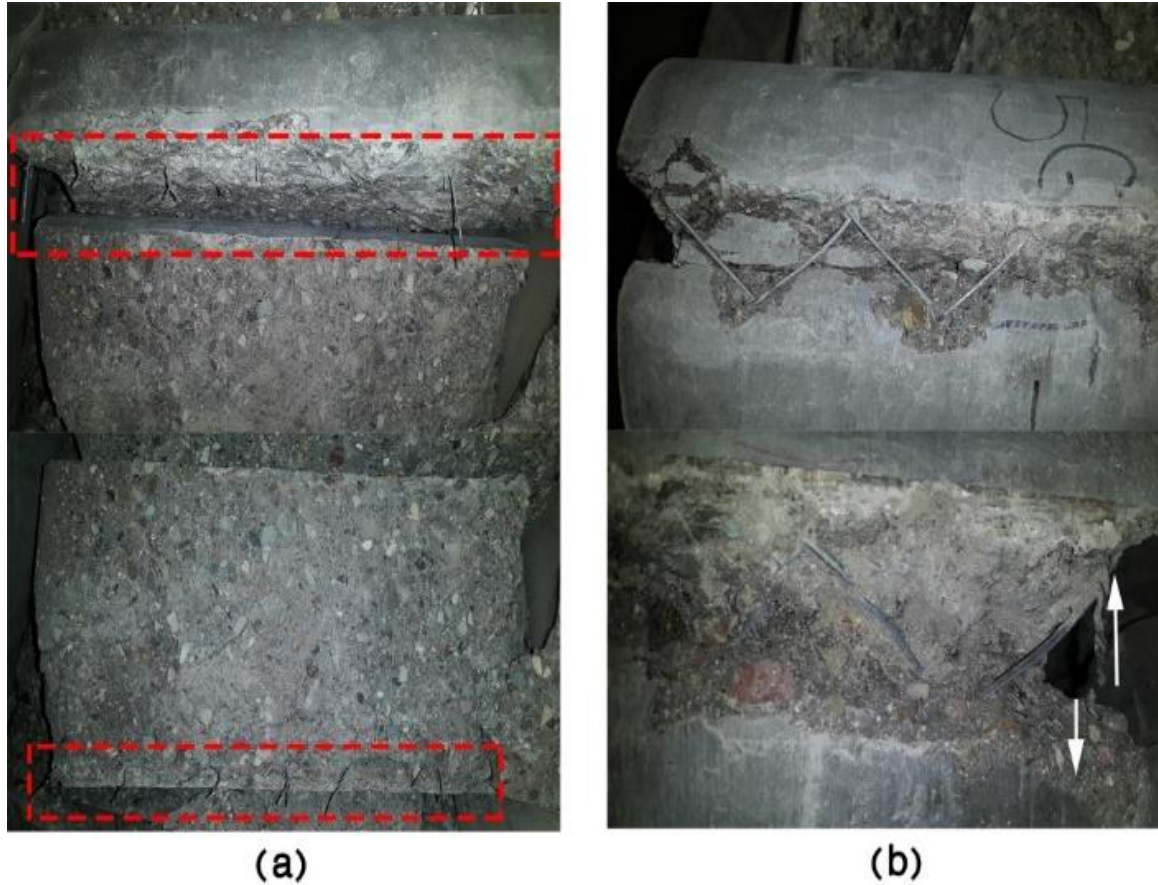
(a) wires failure after yielding in TG2 specimen tensile zone (b) TG5 specimen condition after the final loading stage.
